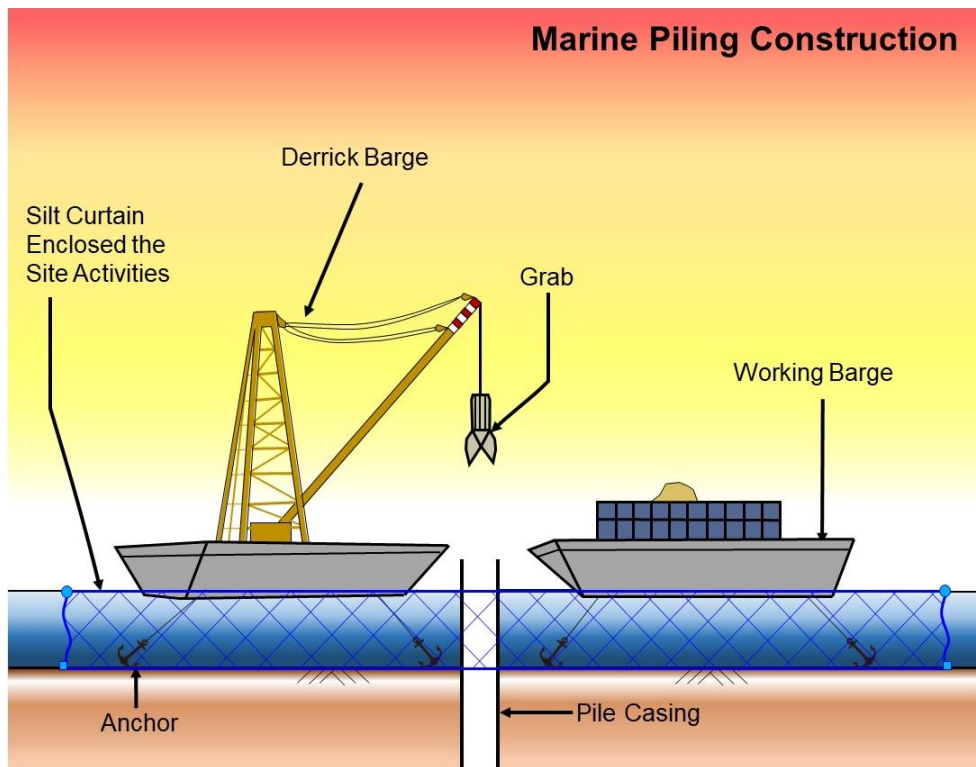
Pile Casing and Silt Curtain for Marine Bored Pile Construction
